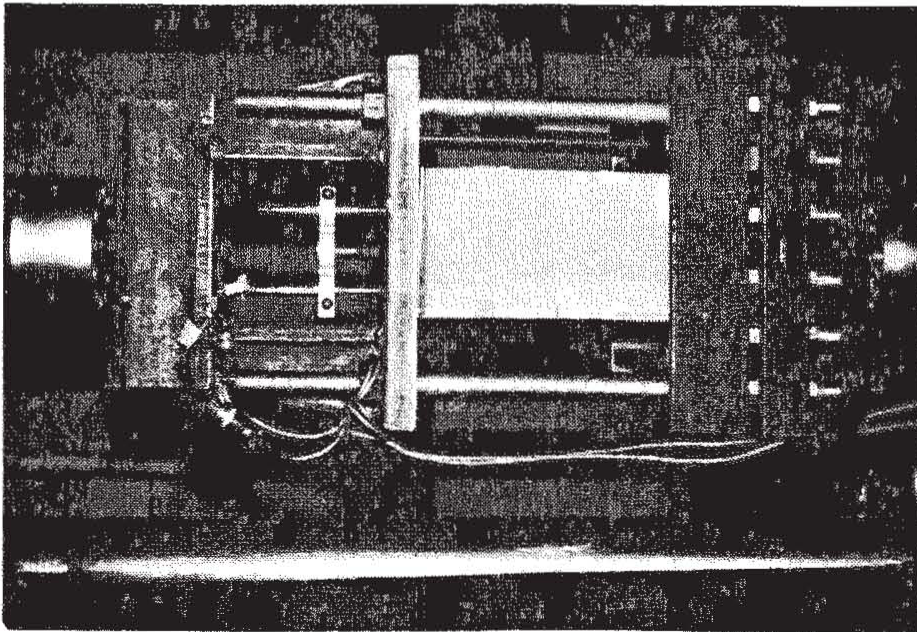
PHOTO OF TEST SPECIMEN PREPARED FOR A TENSION TEST.
